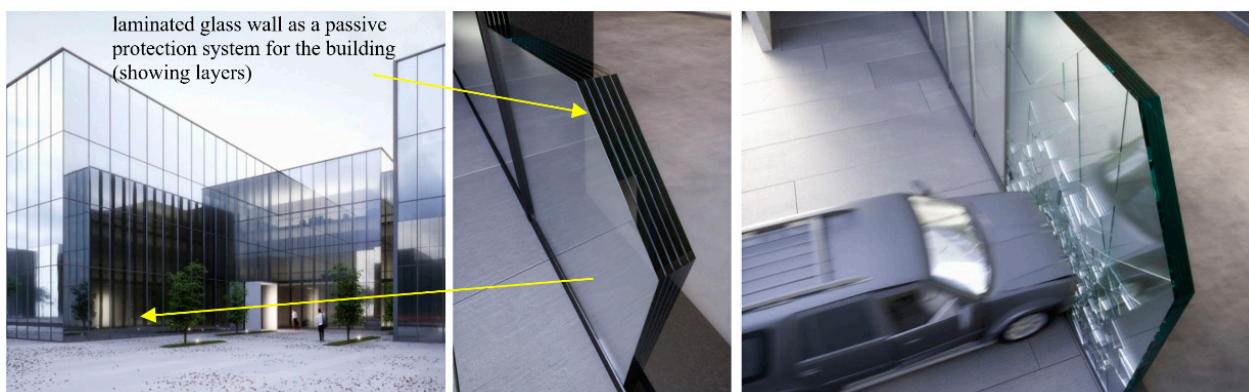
An example of a possible deployment of a laminated glass wall as a passive protection system with a fully glazed facade.
